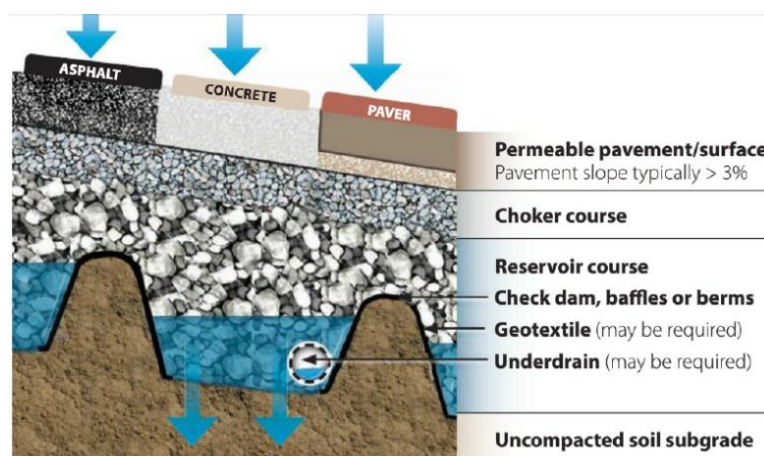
Sloped permeable pavement, built to secure infiltration to the ground (Eisenberg et al.)
